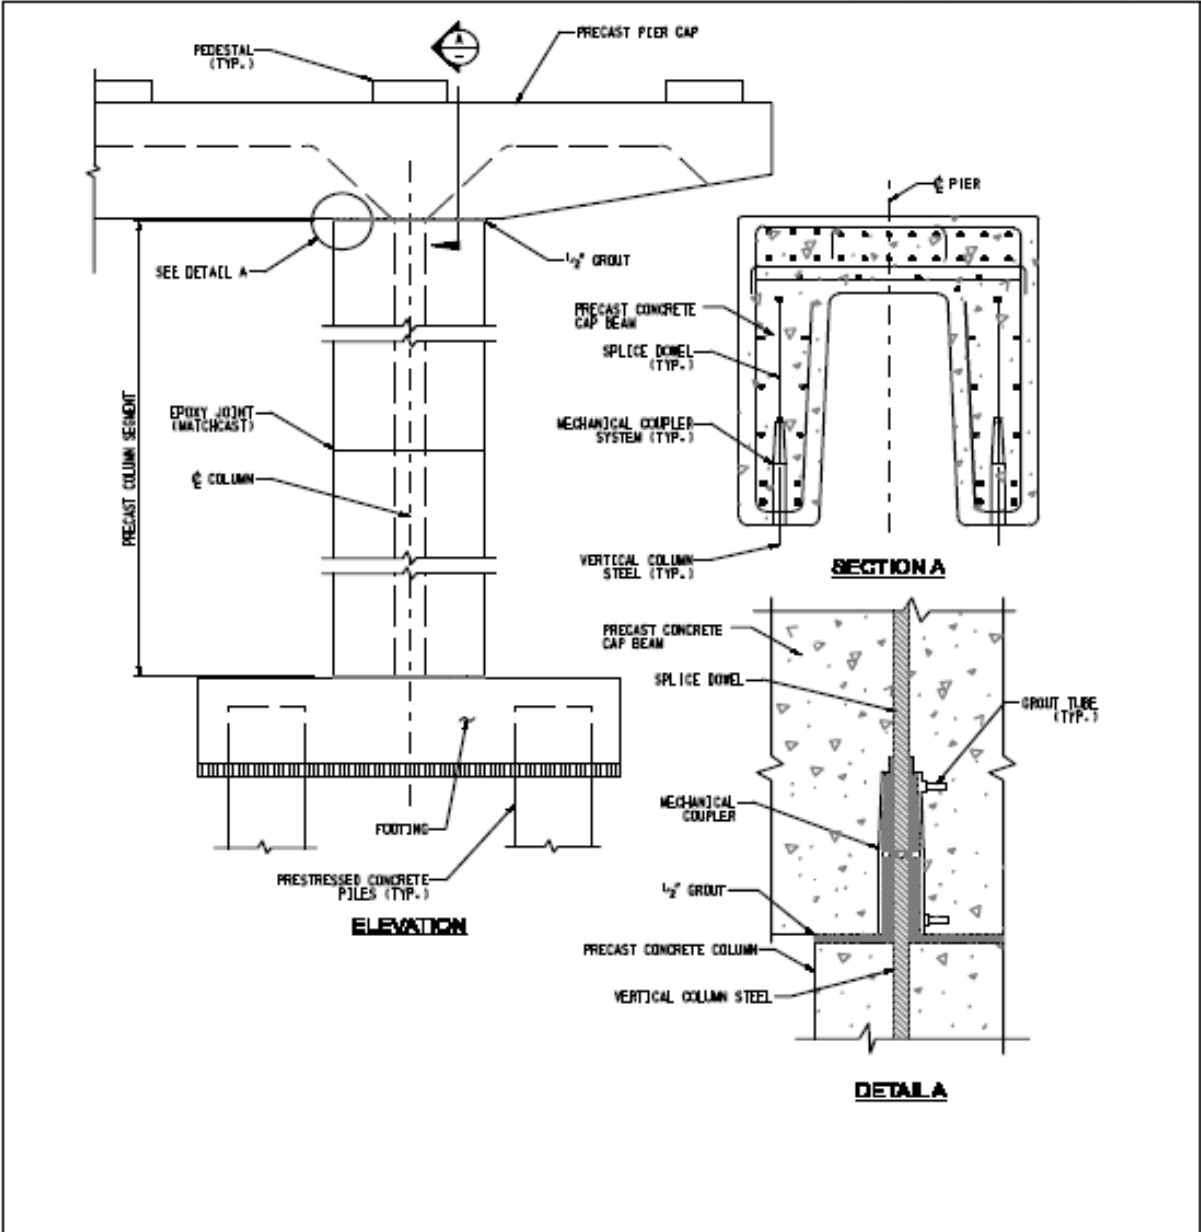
Data sheet for precast column connection in Edison Bridge in Florida (1/2) (FHWA 2009)
